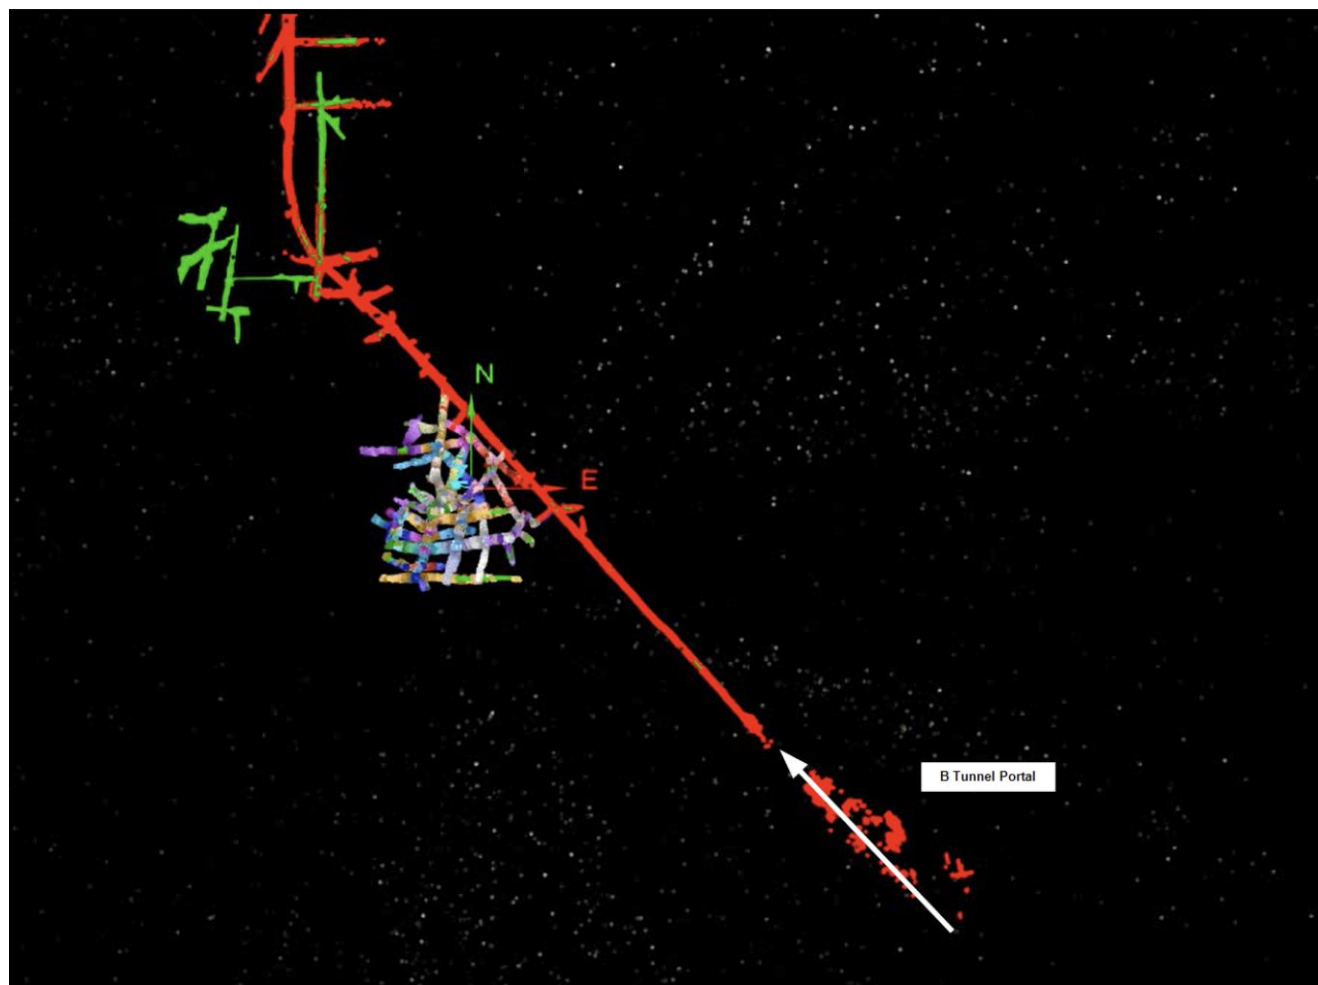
Image from the 3D scan of the 'B' Tunnel and intersecting underground workings (source: Bathurst)
